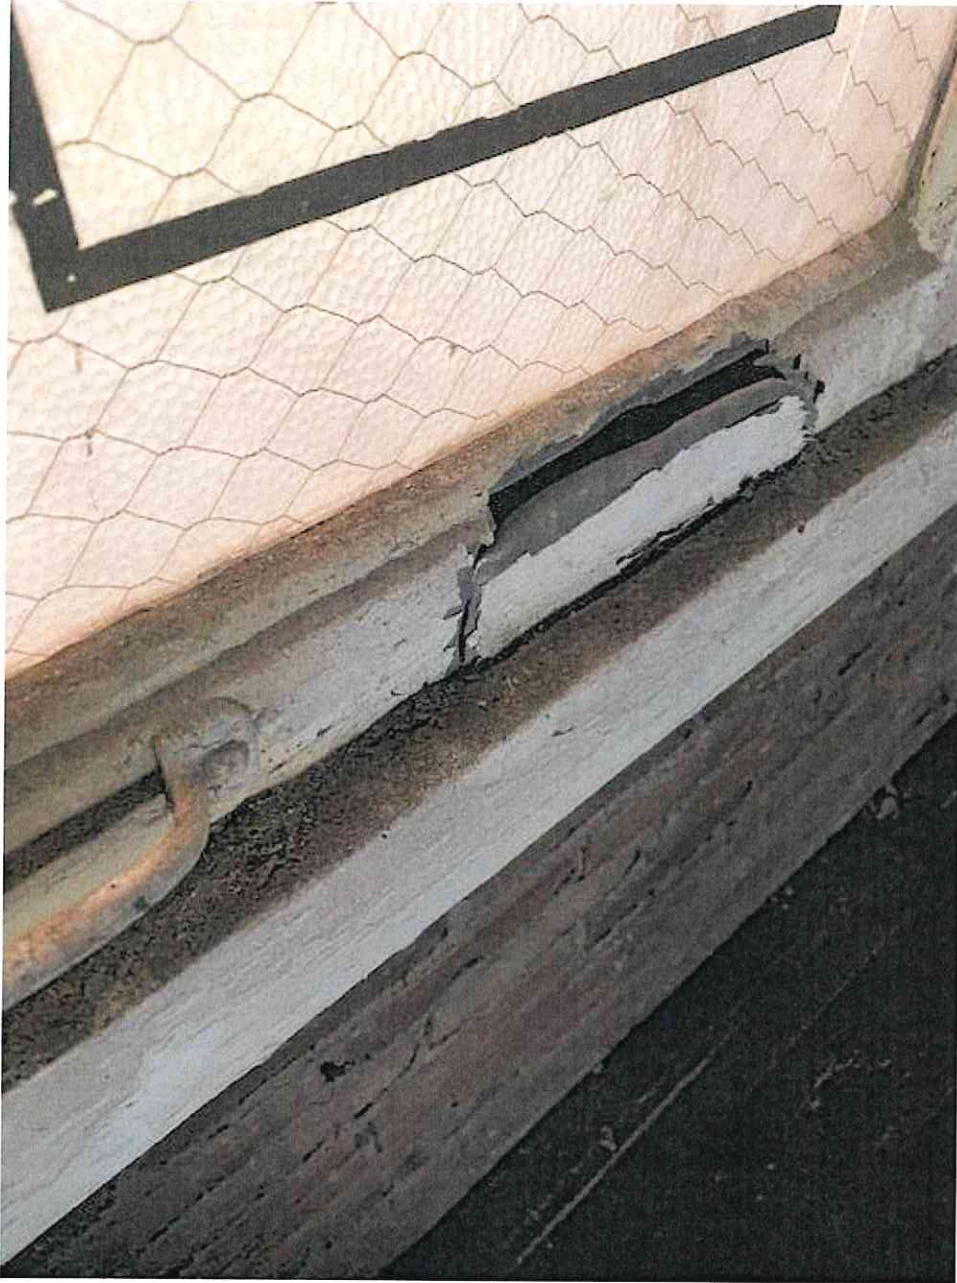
Damaged bottom rail, Also shows “hollow metal” cavity within the steel windows
